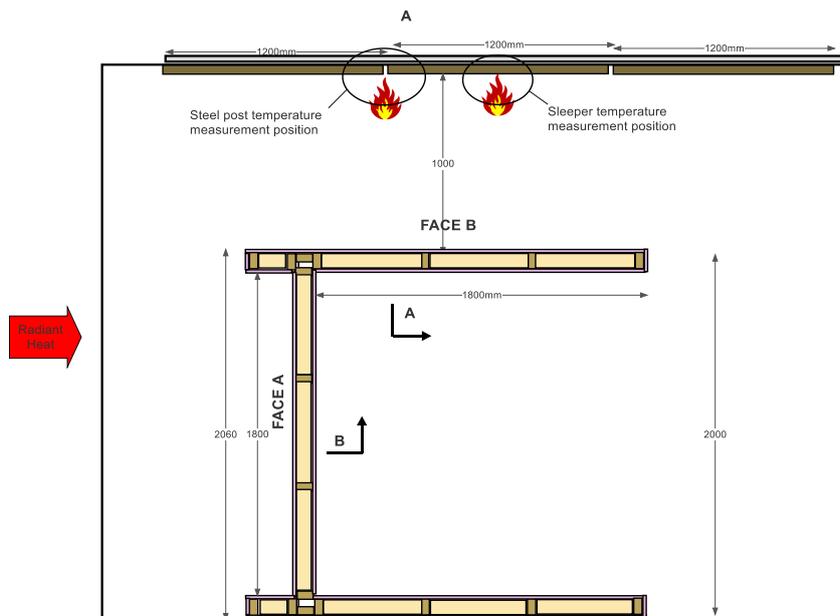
Garden bed retained above path with wall facing reference building - radiant heat perpendicular to face of sleeper wall,
